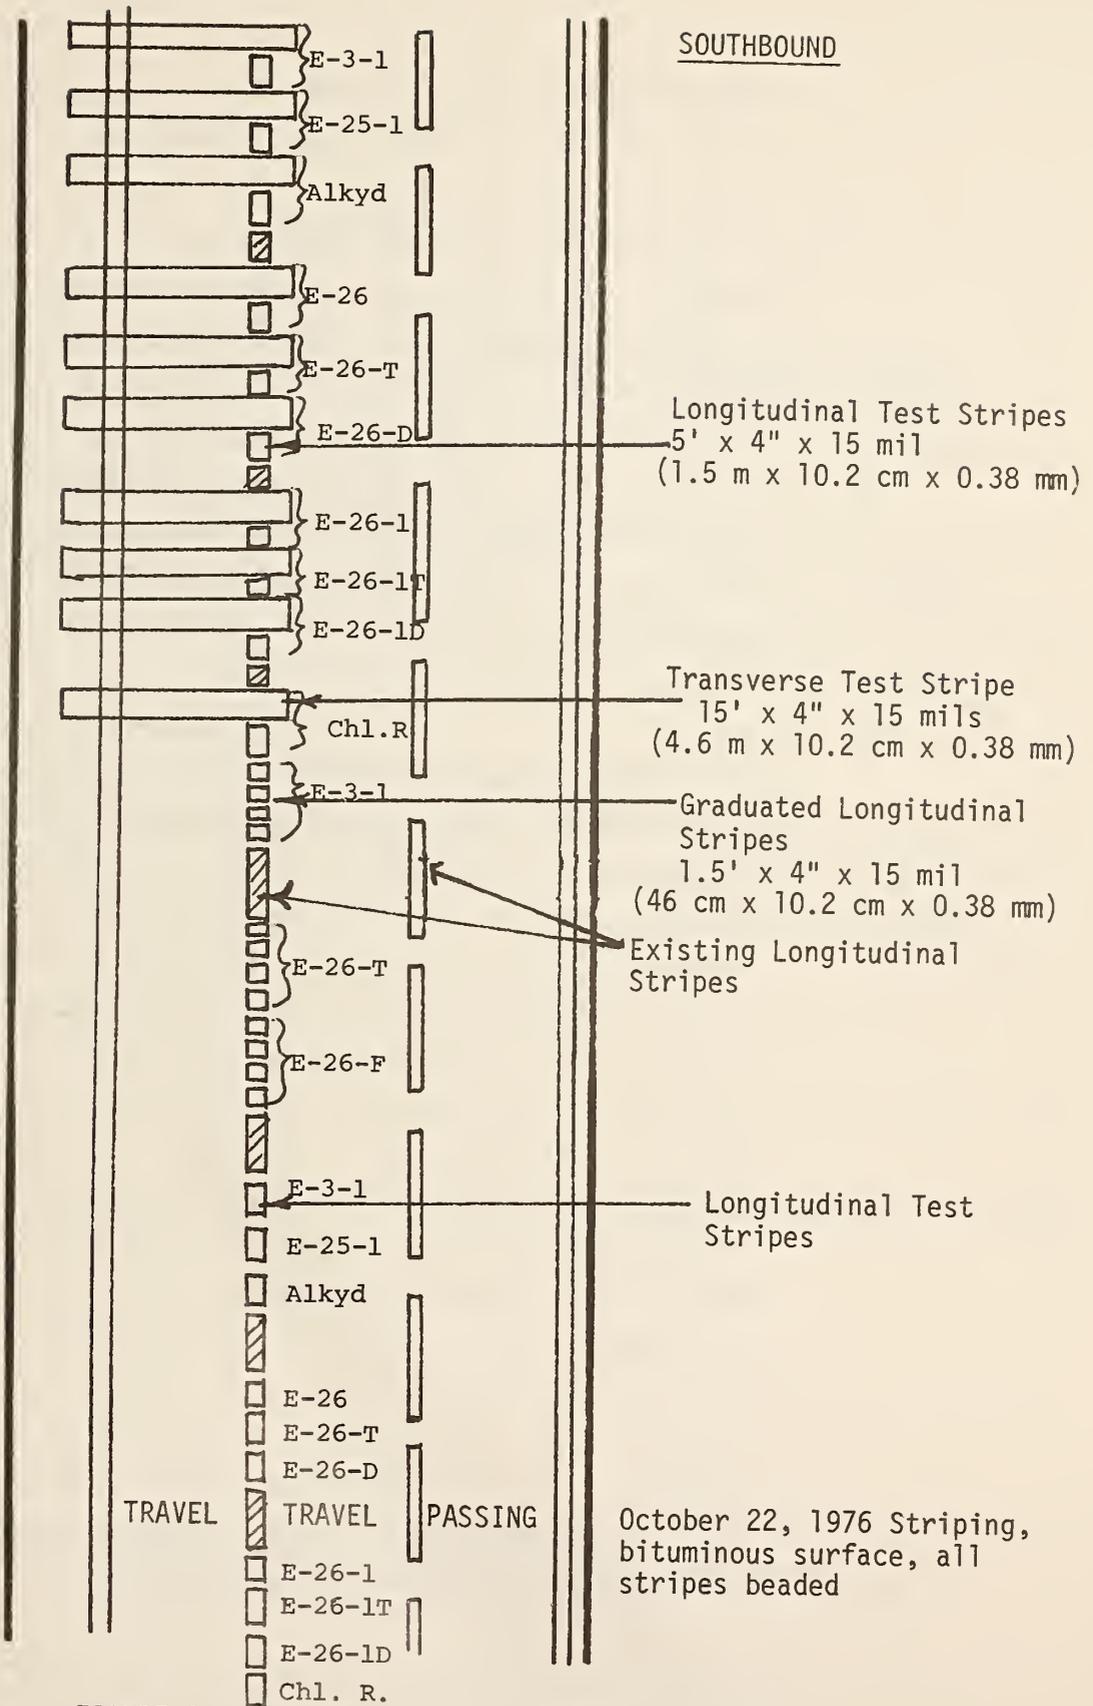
SECOND ROUTE 128 STRIPING LAYOUT
